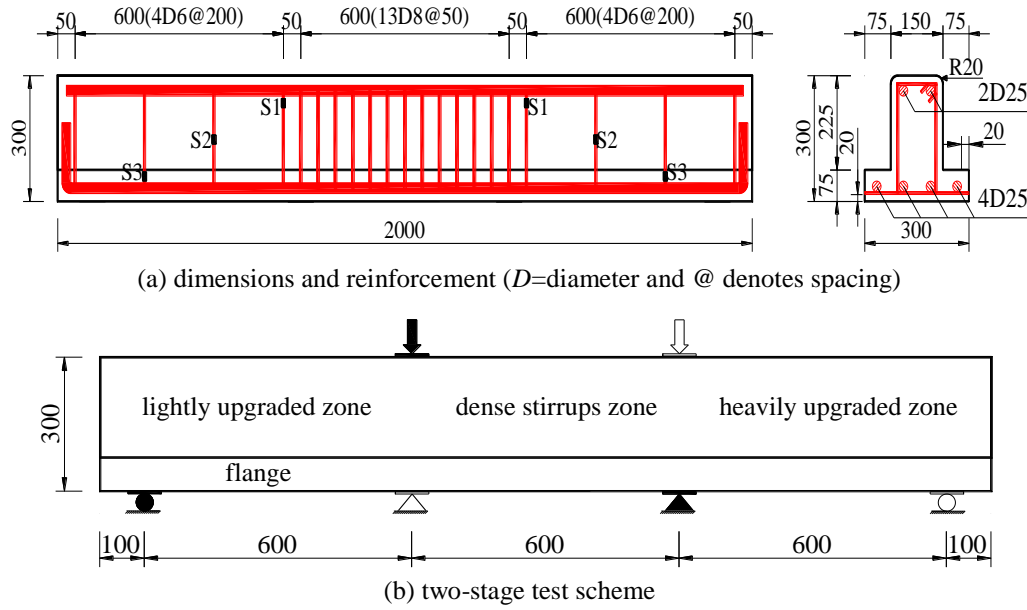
Details of the specimens and testing program (all dimensions in mm)
